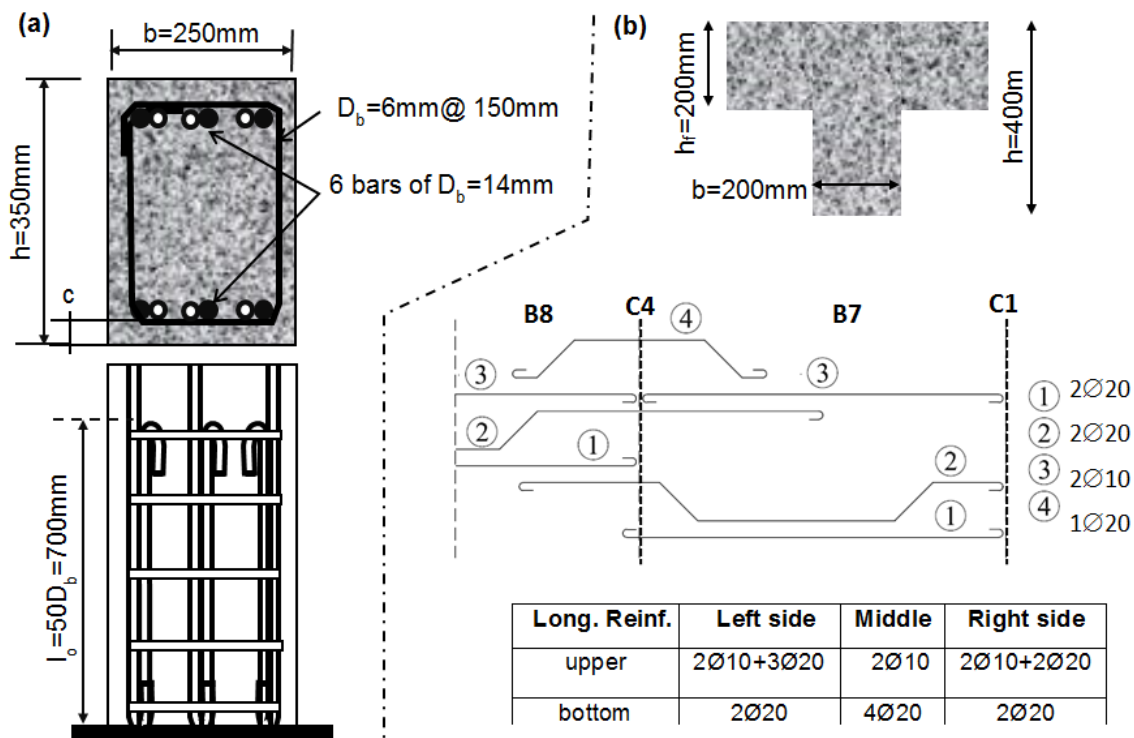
(a) Column cross section detailing and splice arrangement at column base and (b) beam geometry and longitudinal reinforcement detailing.
